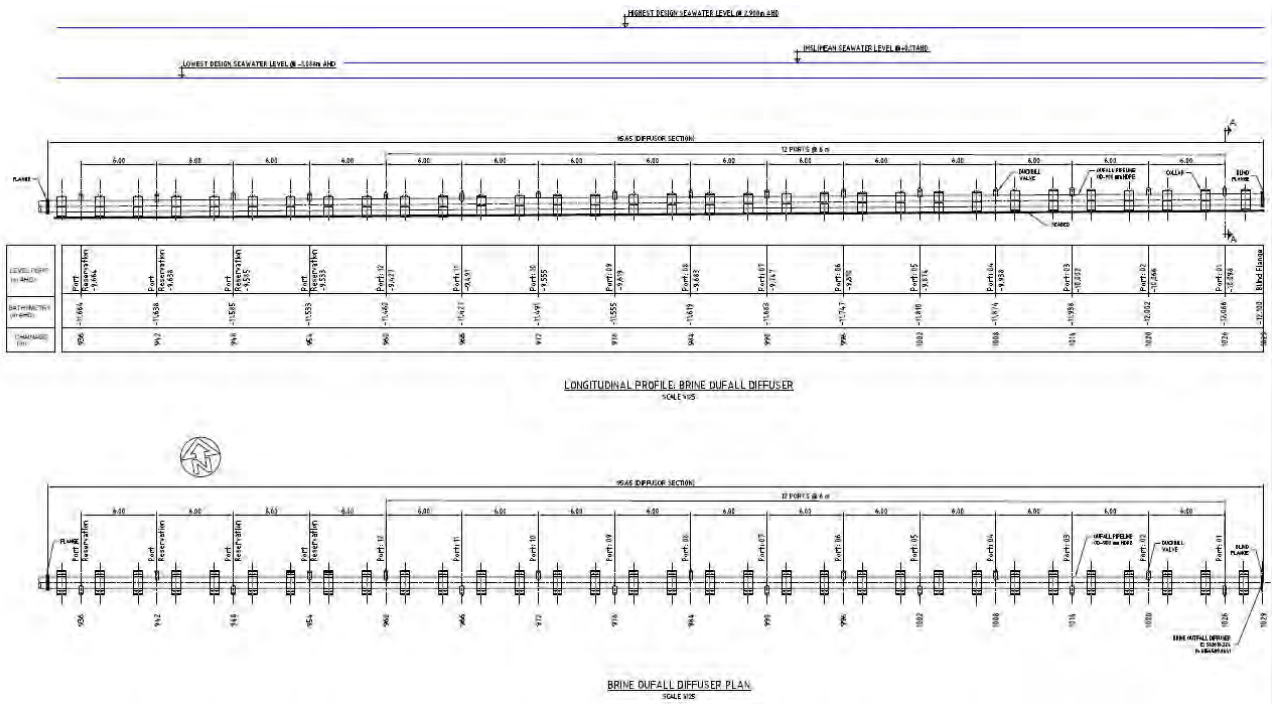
EPDP proposed diffuser design (Acciona, 2024). Top: longitudinal view; bottom: plan view
